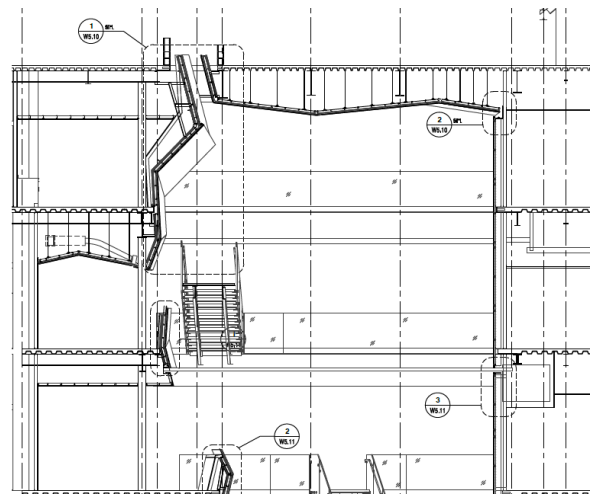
Section Cut through Atrium Space Showing the Architectural Screen Wall Flow and Locations
